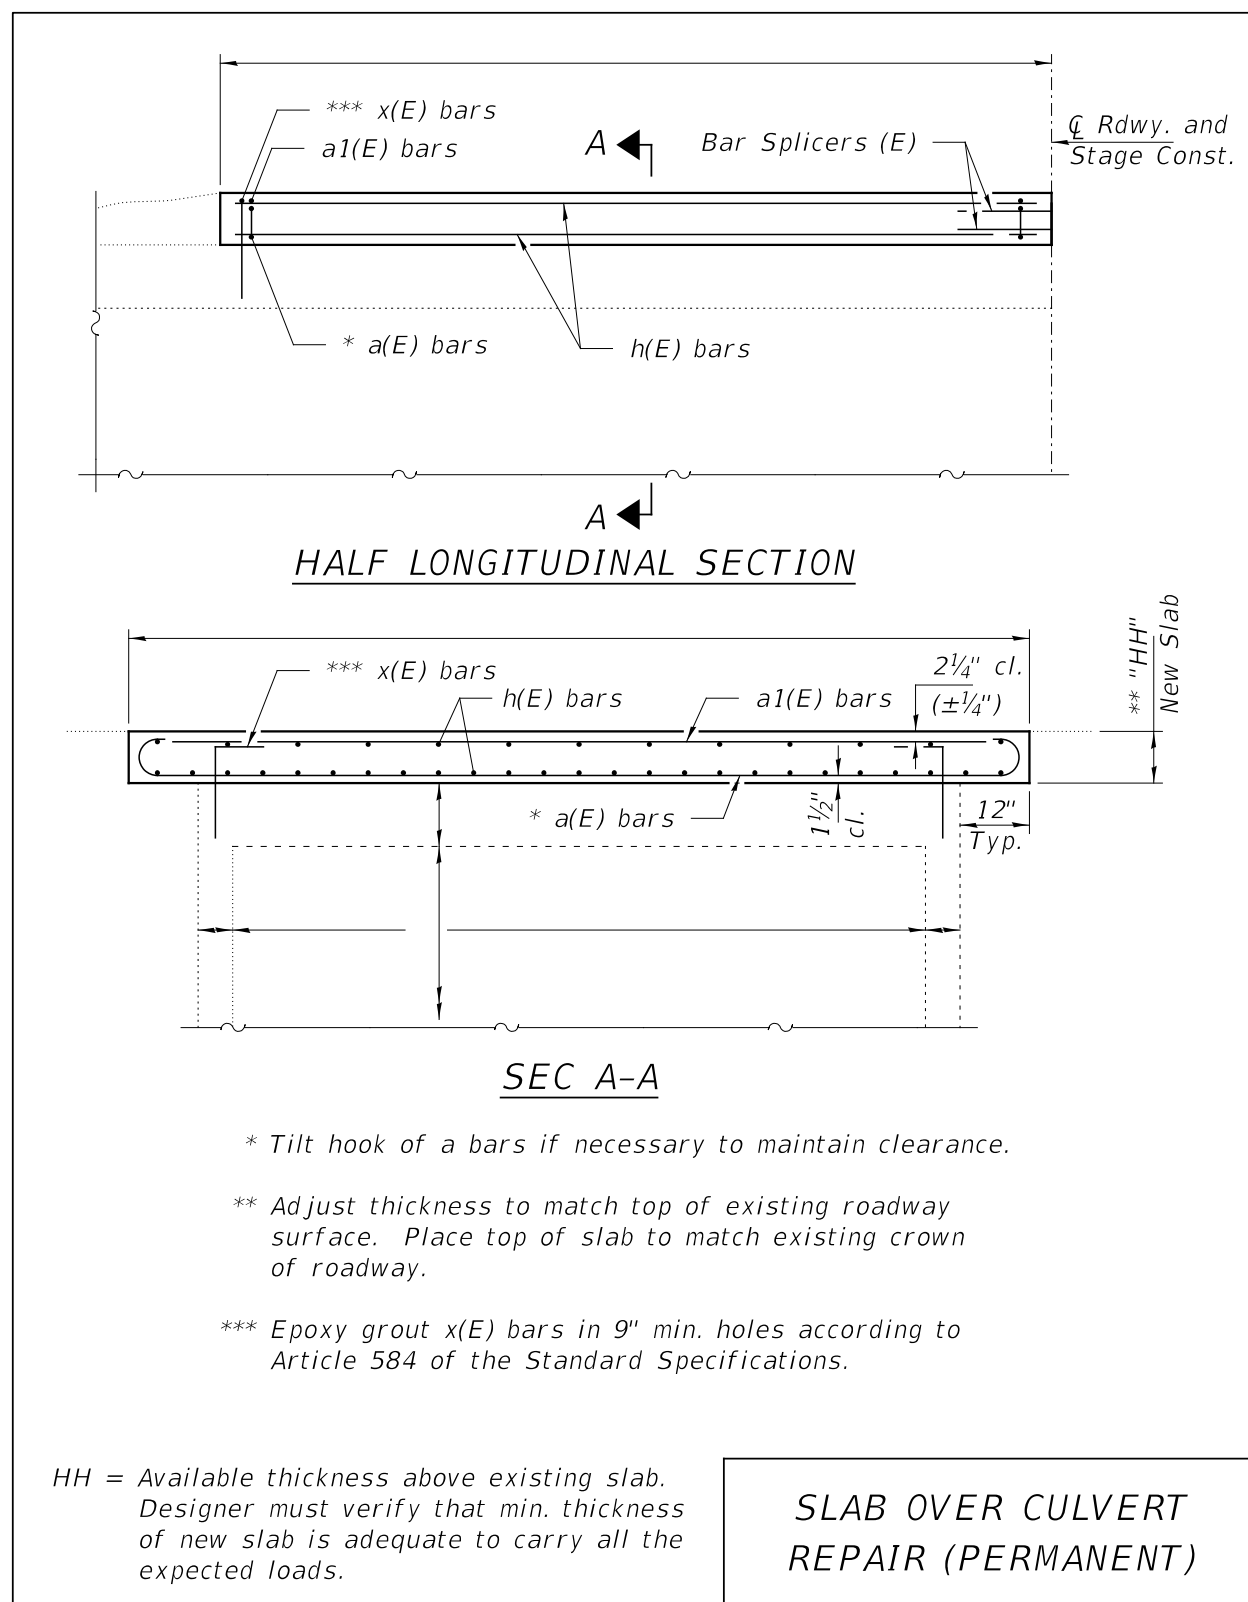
Slab Over Culvert Repair (Permanent)
